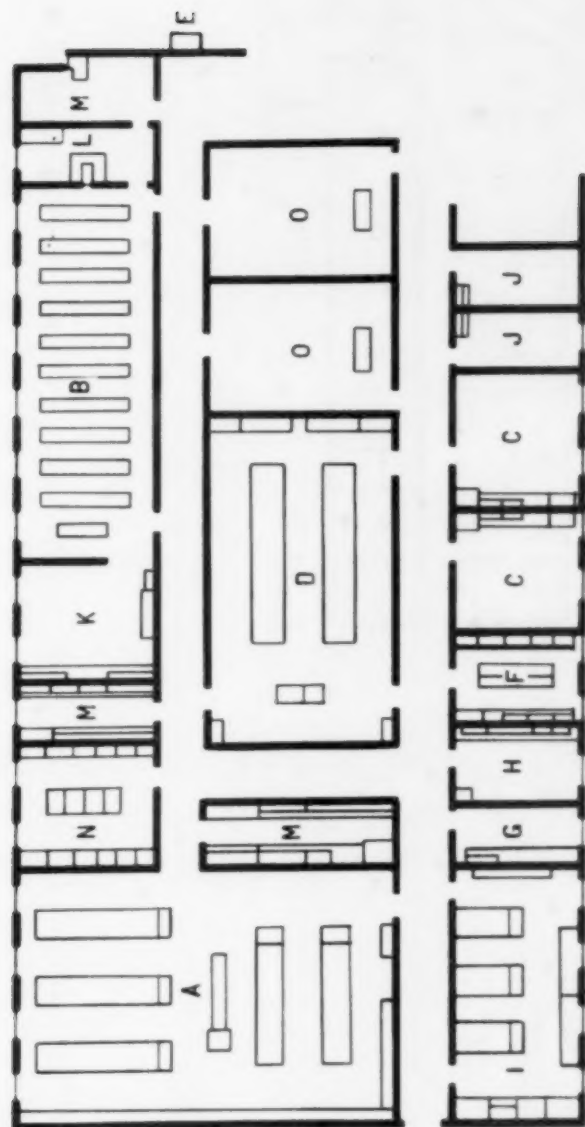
FIRST FLOOR PLAN, SCHOOL OF PHARMACY, WEST VIRGINIA UNIVERSITY
